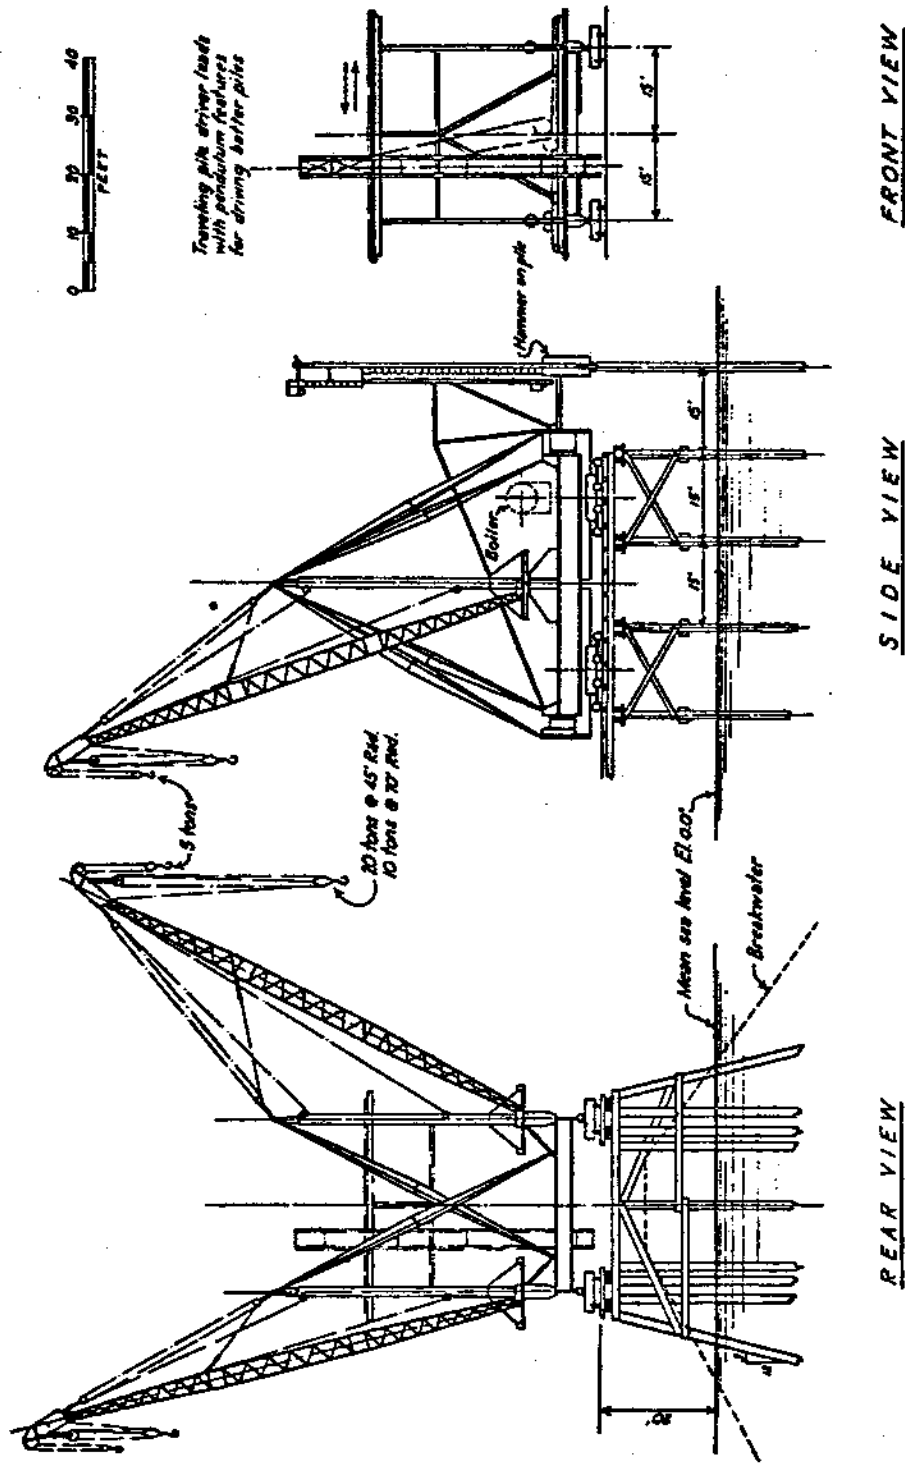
Typical Cross-Section of Trestle and Traveler used for Construction of Coco Solo Breakwater (Quinn, 1972, p. 204)
